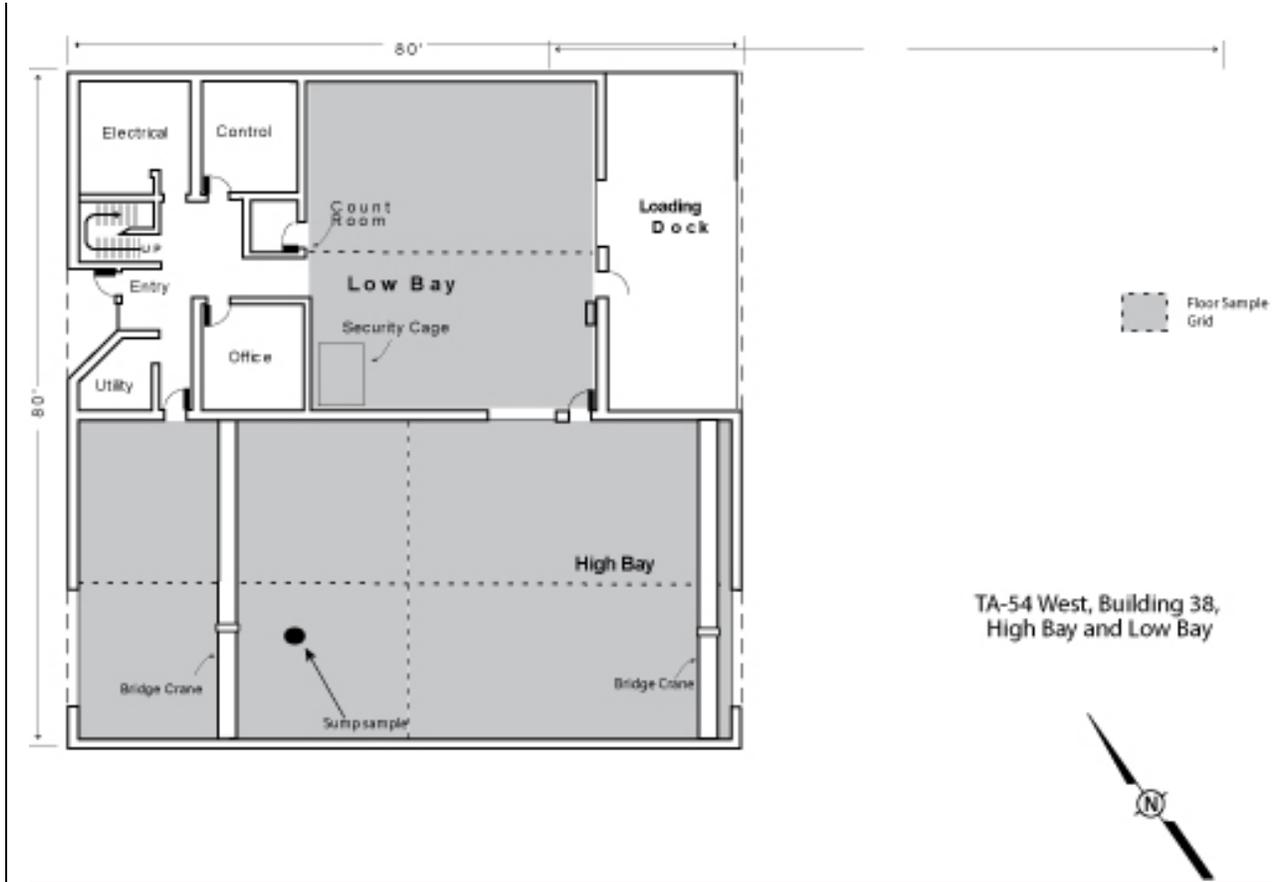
Technical Area 54, Building 38 (High, ~~and~~ Low Bay, ~~and Loading Dock~~ Sampling Locations)
